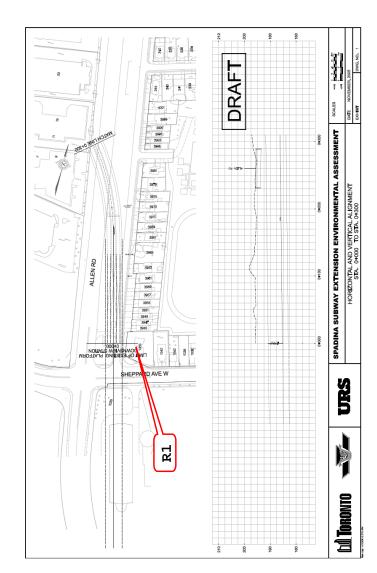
PLAN AND PROFILE OF THE PROPOSED SUBWAY ALIGNMENT
